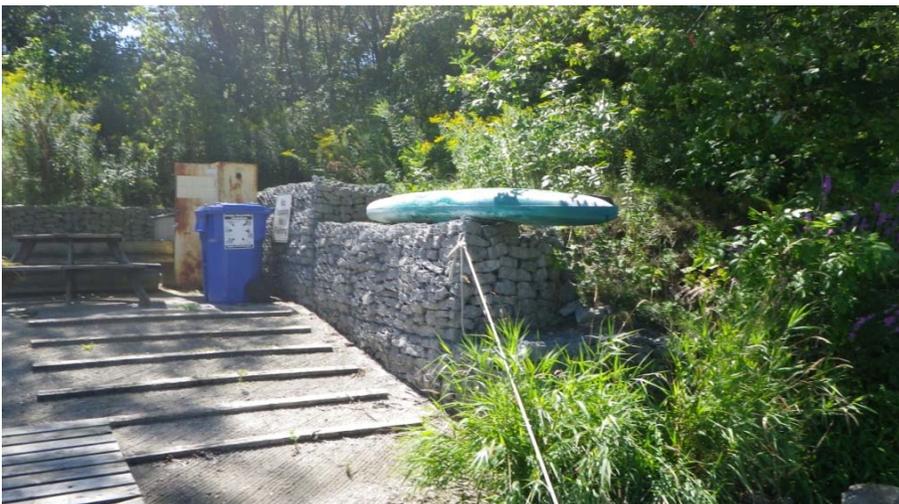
Access Ramp and Gabion Wall in front of Mississauga Canoe Club
